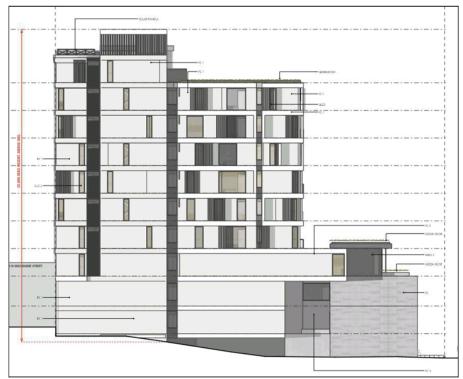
South-western (side) elevation of the proposed building (Source: IreneInc/JAWS).
